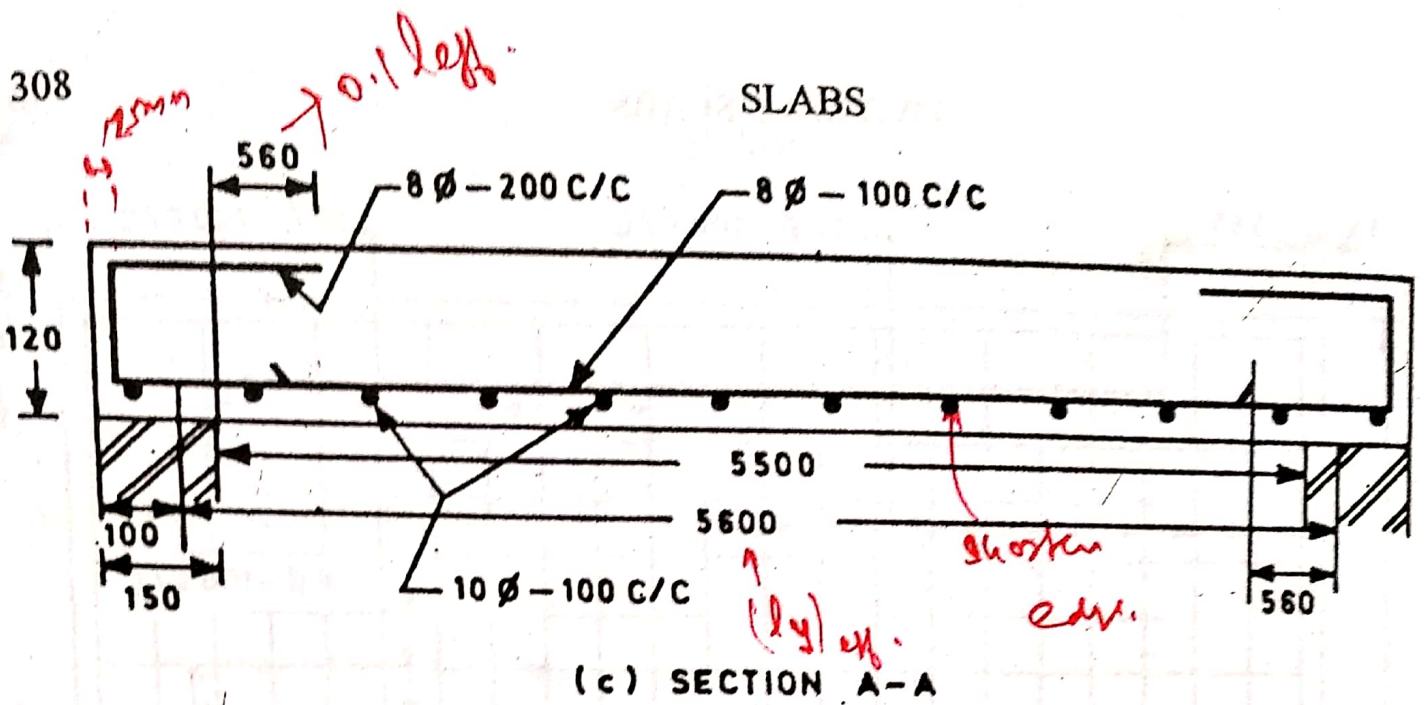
Reinforcement in two-way slabs - corners not held down
